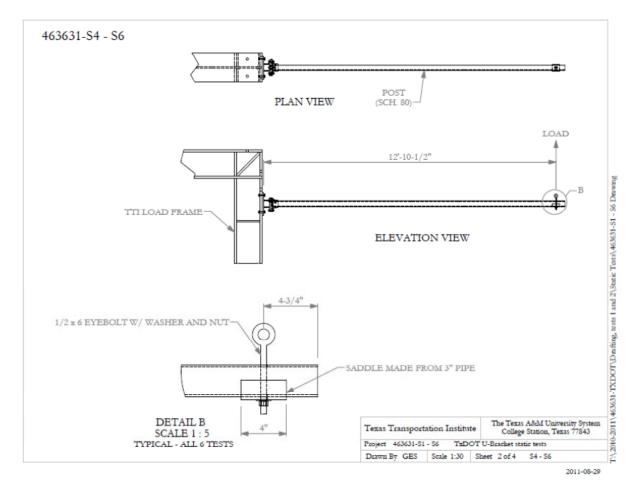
Schedule 80 Pipe Support Static Test Setup Drawings.
